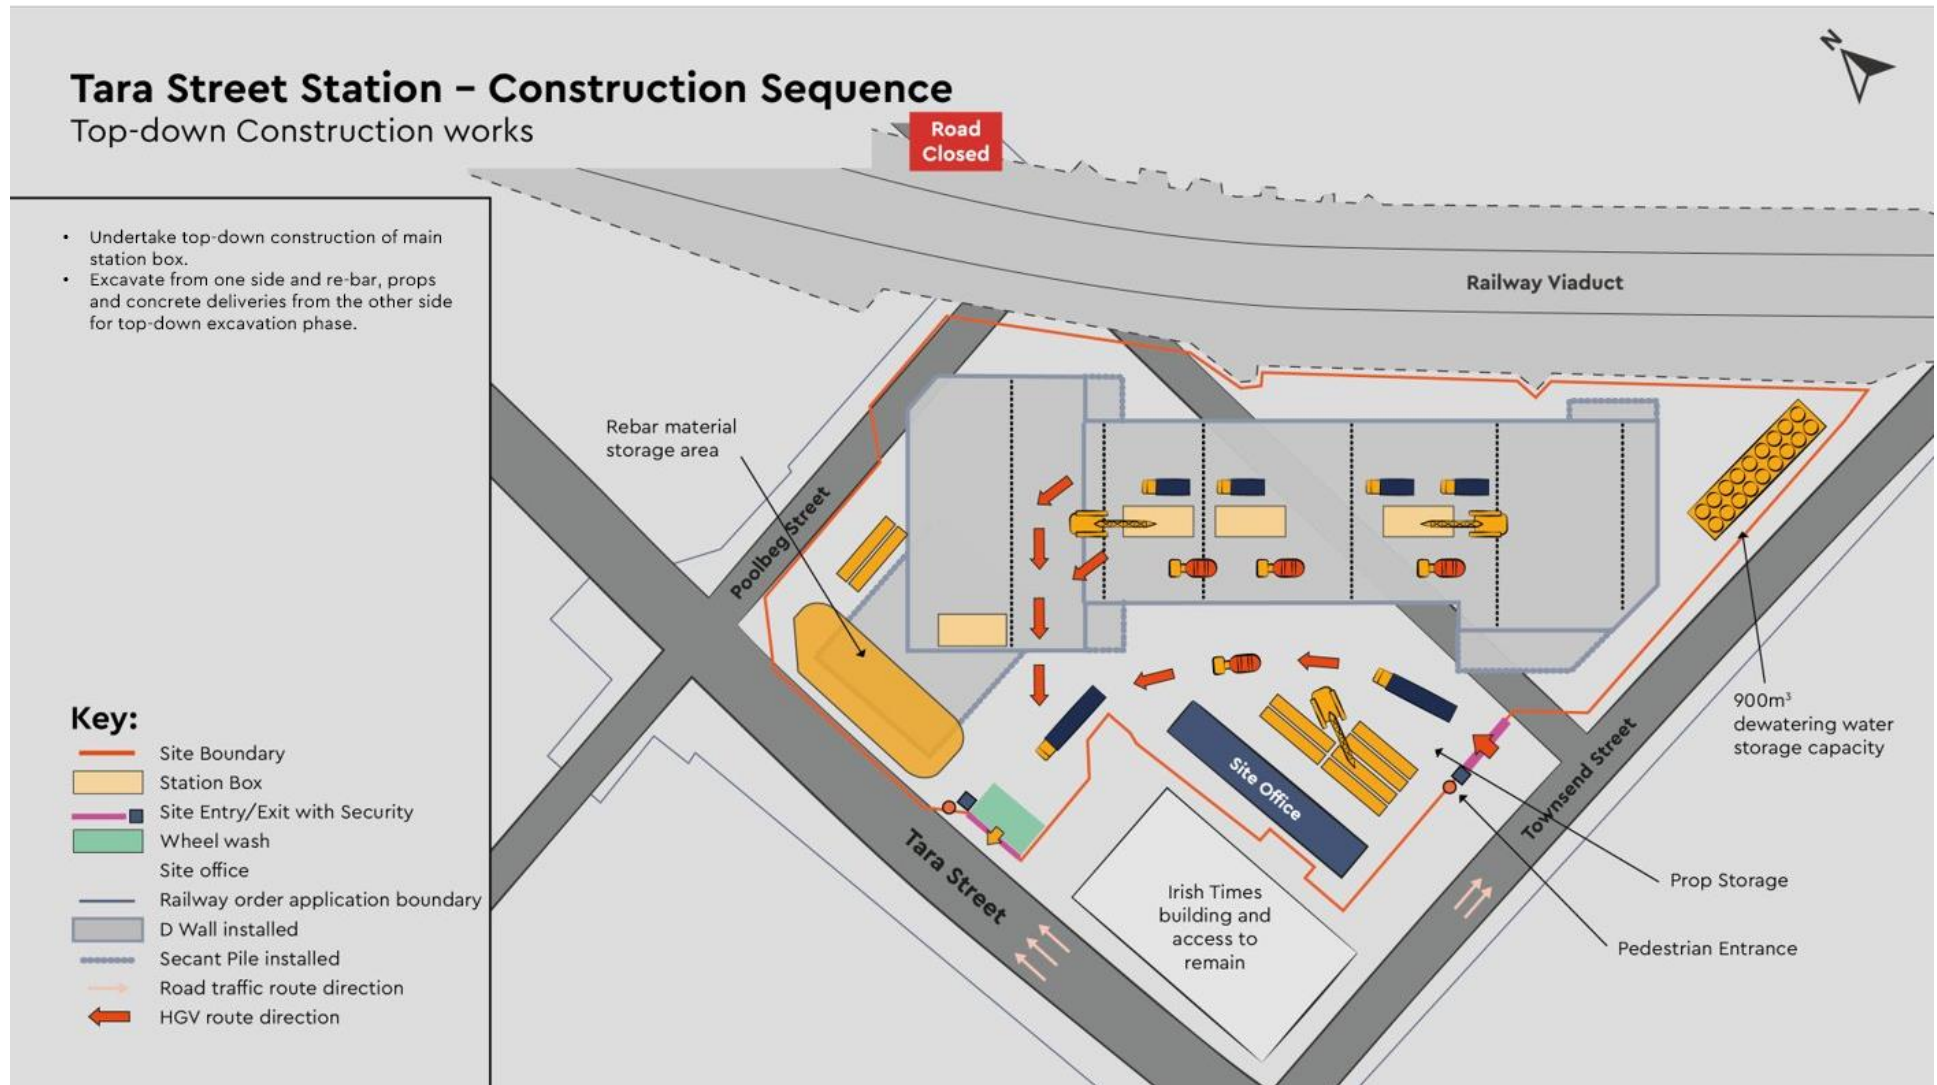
Tara Station Stage 4 - Top-down Construction Works
